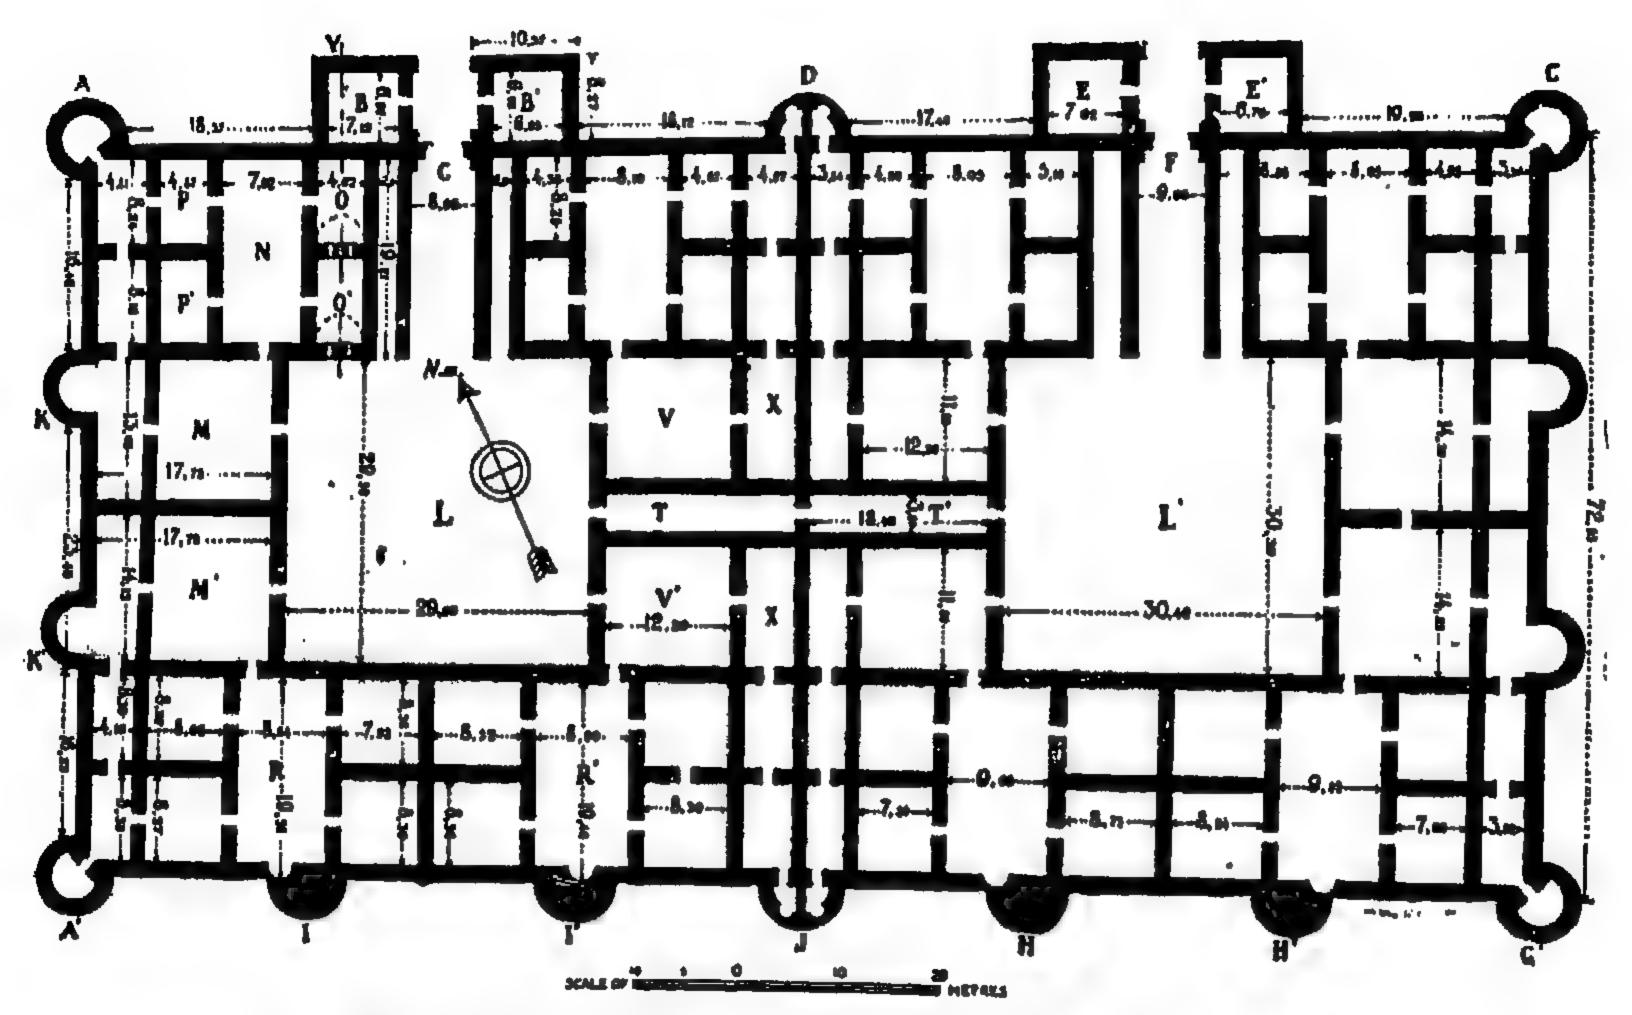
Quin ay-Tuna: Plan. Scale 1: 500. (After Jaussen and Savignec, with slight modifications.)
